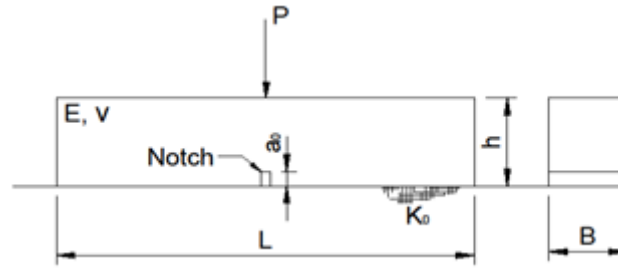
Notched beam on Winkler foundation subjected to a central point load
